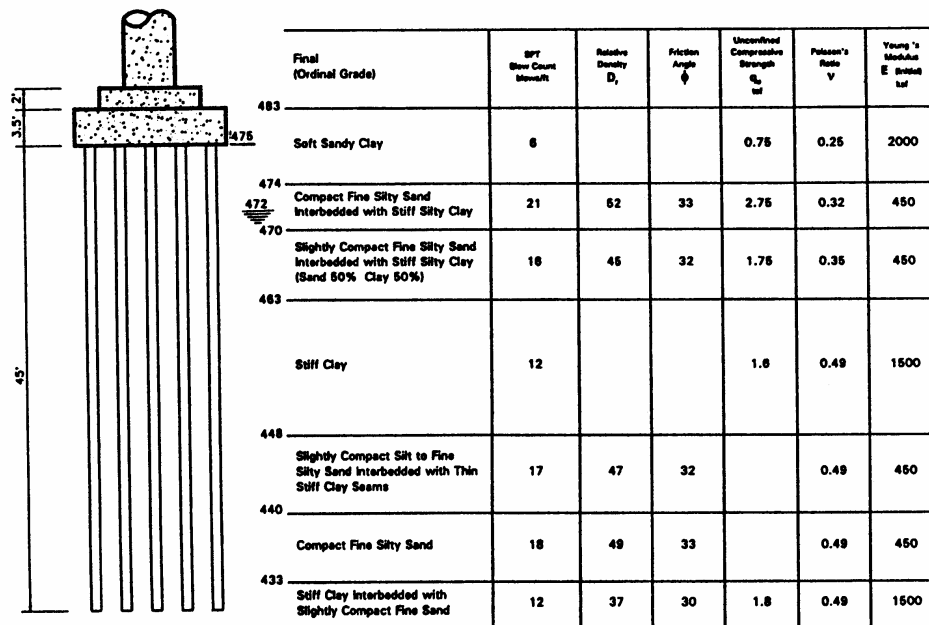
Soil Profile at the Foundation of the Central Pier of the MRO [after Noris and Sack (1986)].
